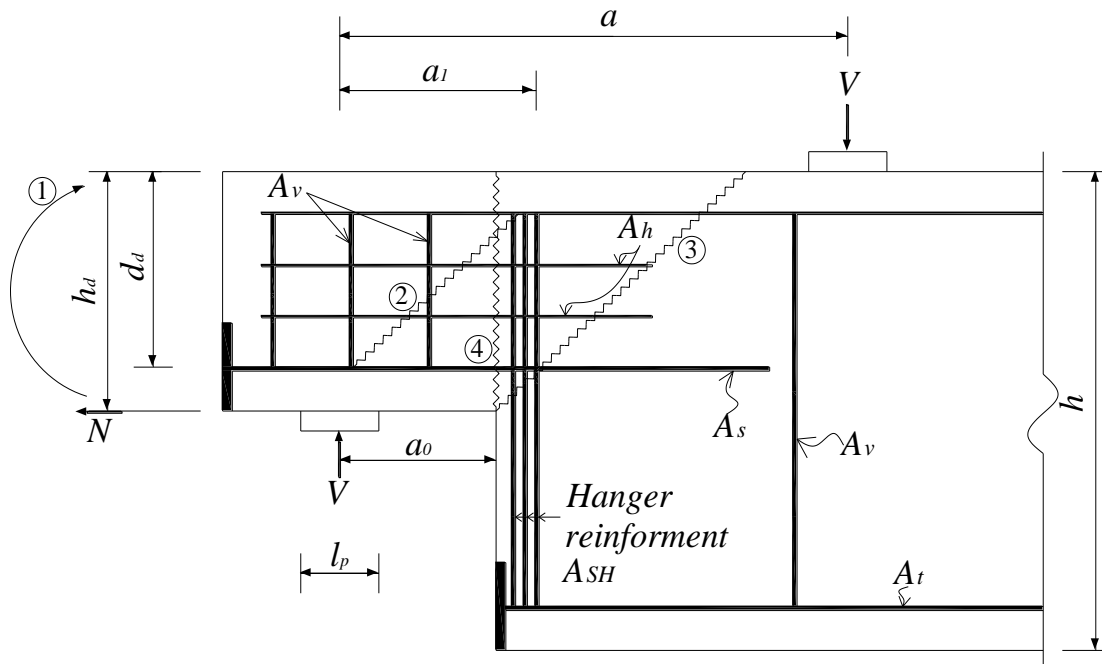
Potential failure planes of dapped-end beams in PCI design handbook.
